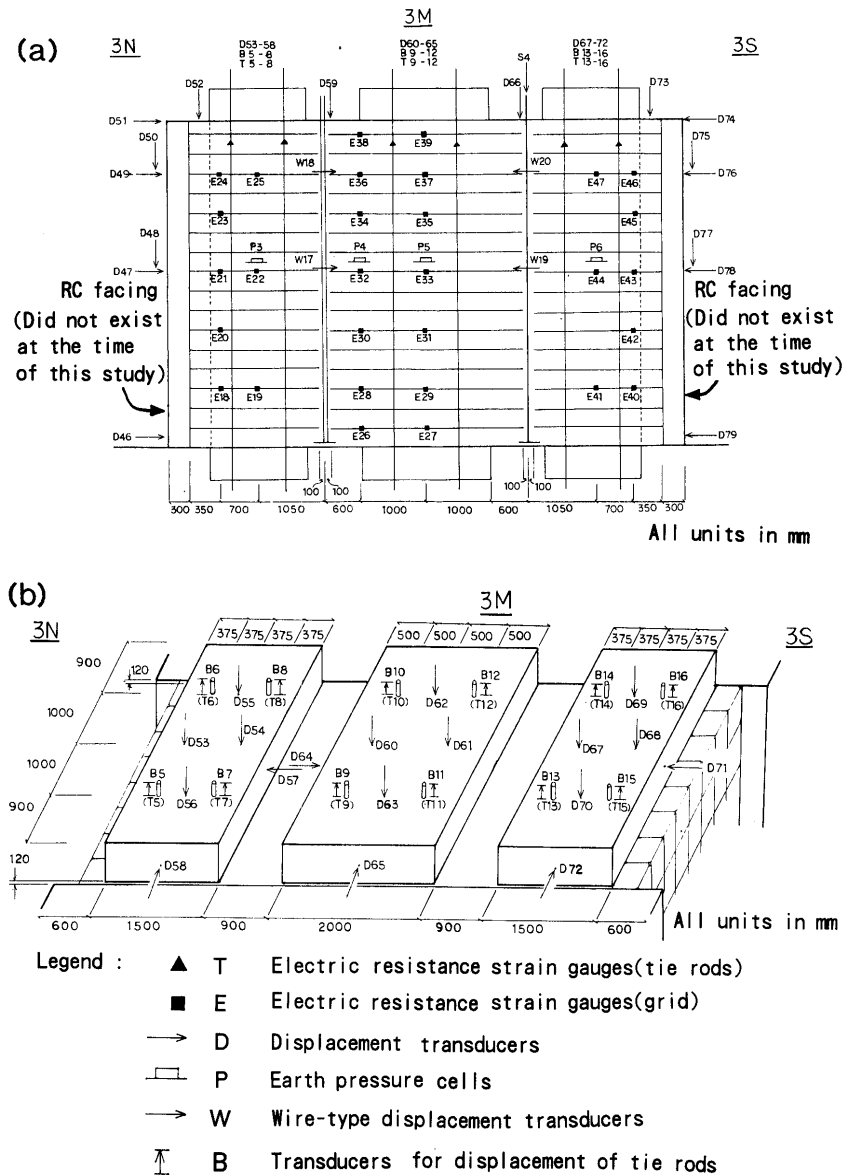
Cross-section and crest of the section 3 having three test segments of grid-reinforced gravel
